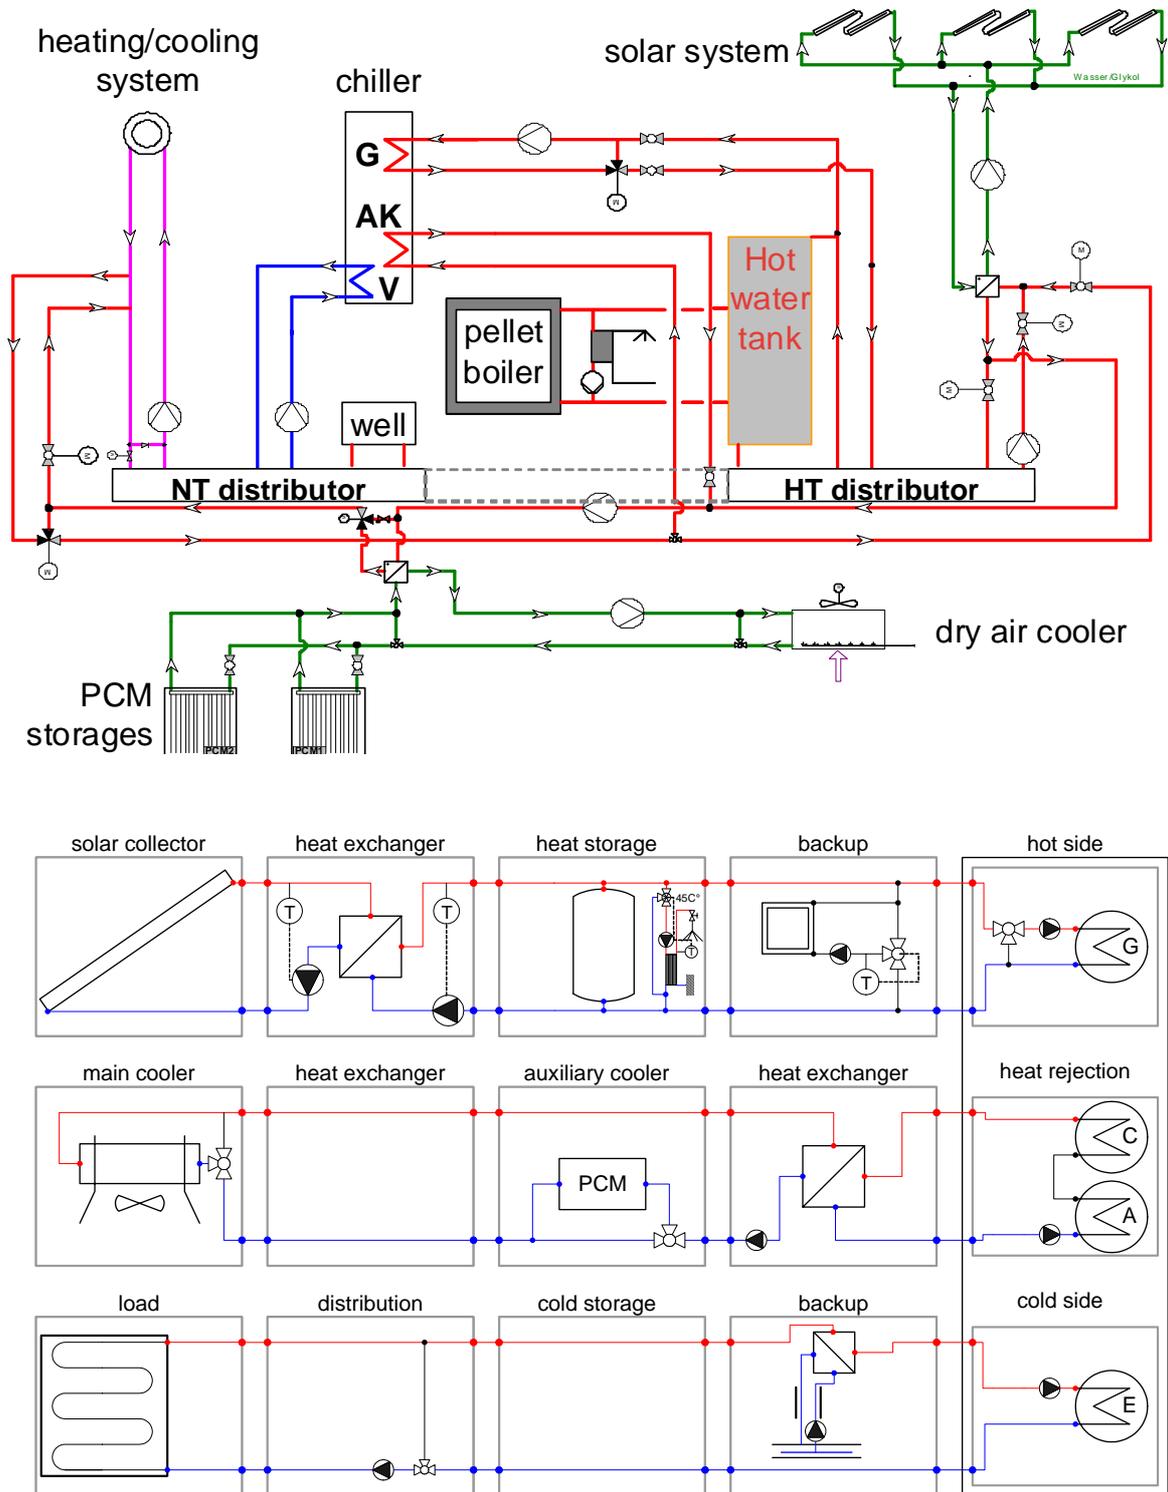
Solar heating and cooling system, Example 5: Pilot installation at ZAE Bayern, Garching, Germany (source: ZAE Bayern).
